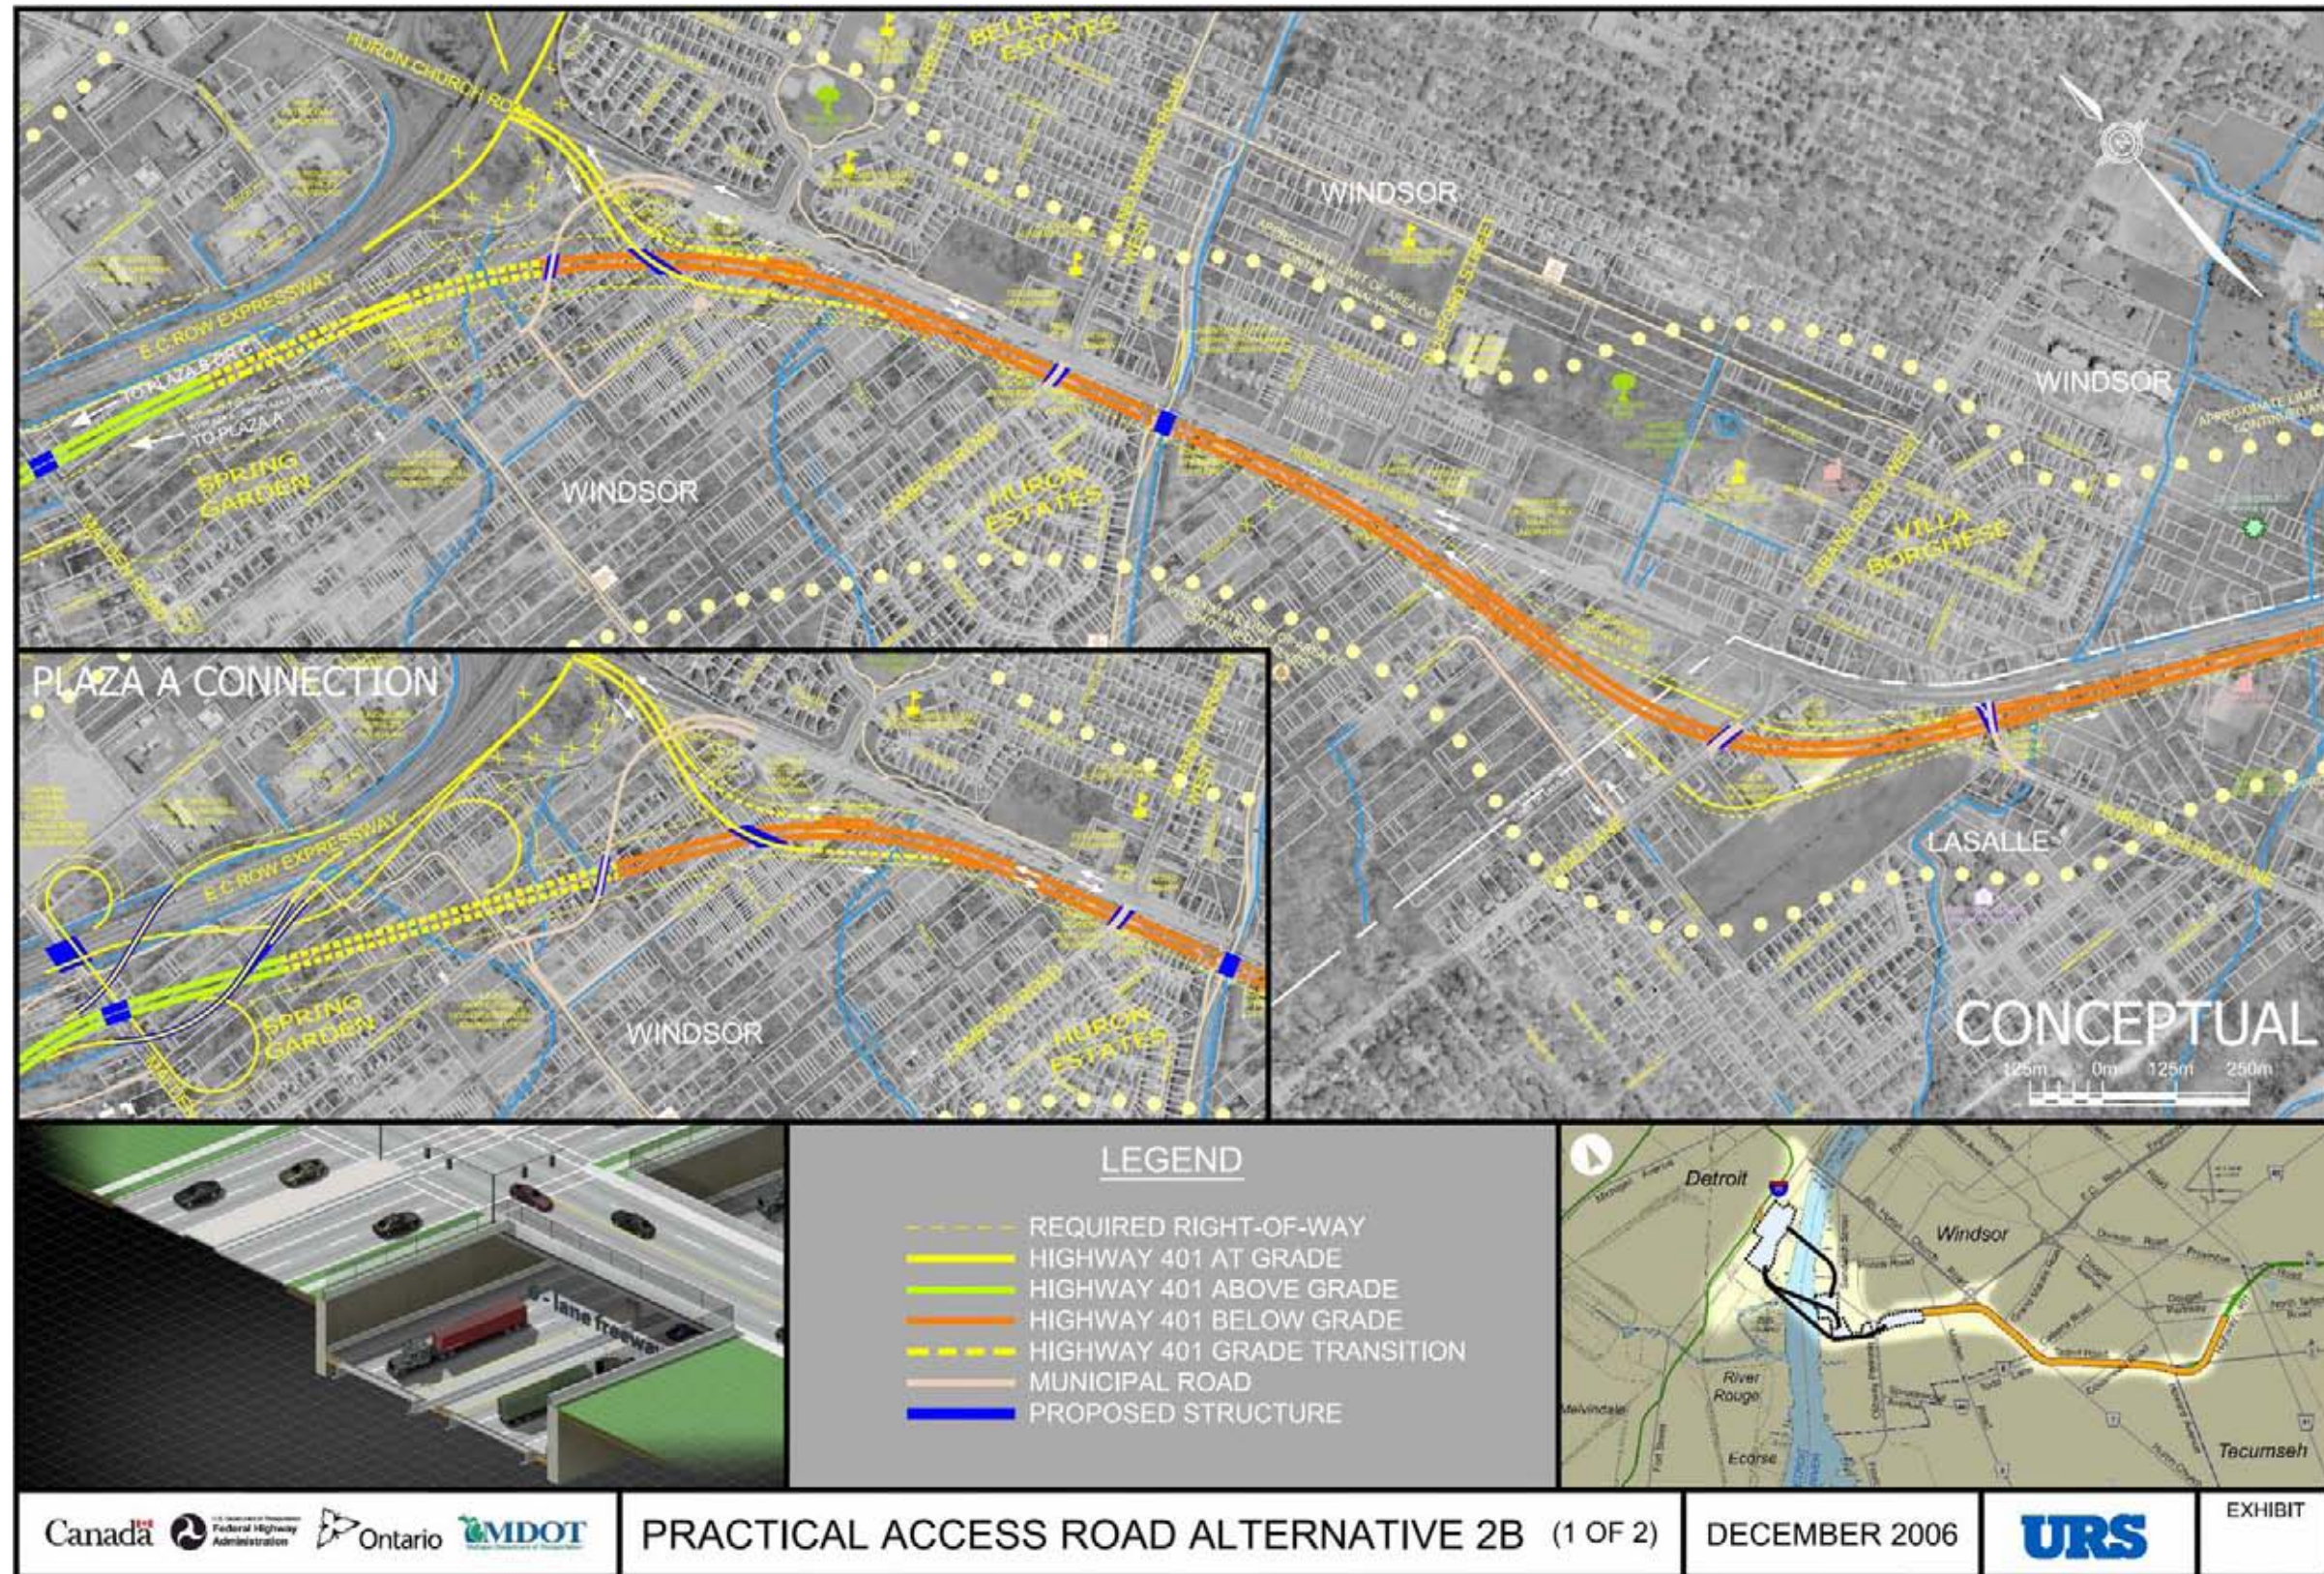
A – PRACTICAL ACCESS ROAD ALTERNATIVE 2B
